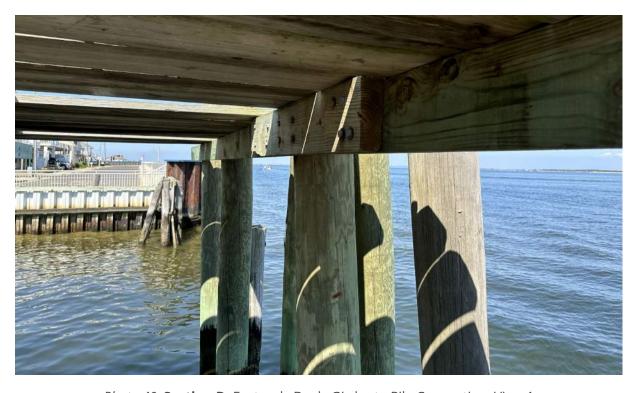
Section D, Easternly Dock, Girder to Pile Connection, View 1
